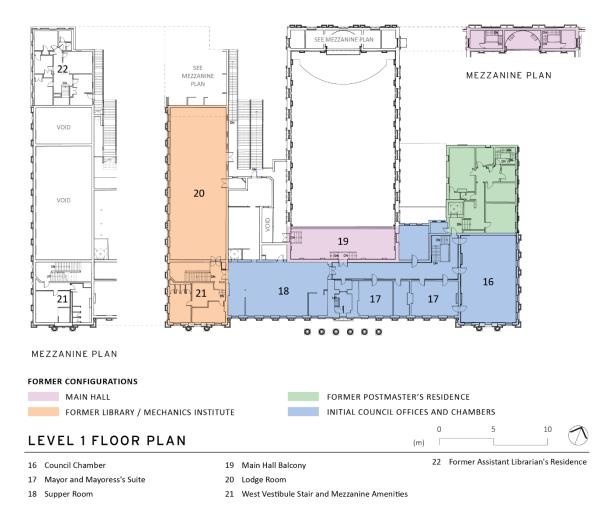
Existing conditions first floor plan overlaid with locations (approximate) of original functions
